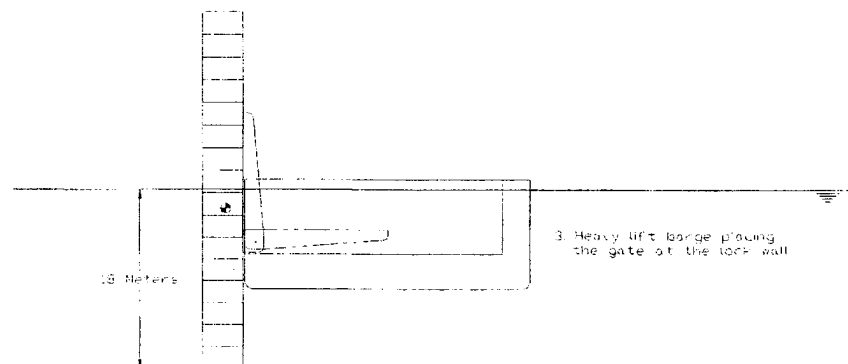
Heavy Lift Barge Setting Gate on Pintle
